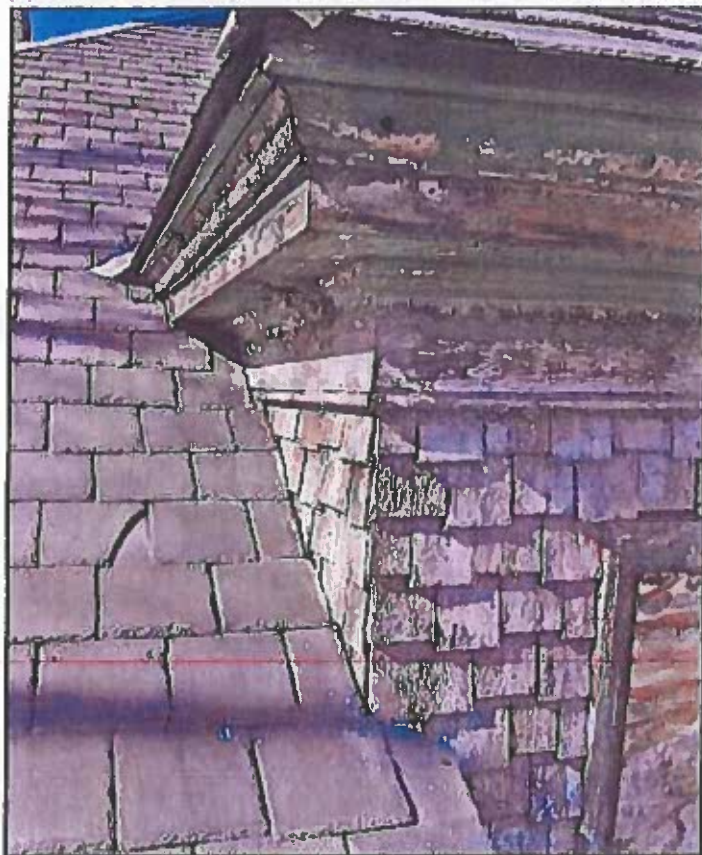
Detail of east pitch of main barn roof at southern dormer showing that wood shingles on dormer cheek wall extend below slate, and that the only flashings appear to be the original ones for the wood shingles under the slate.
